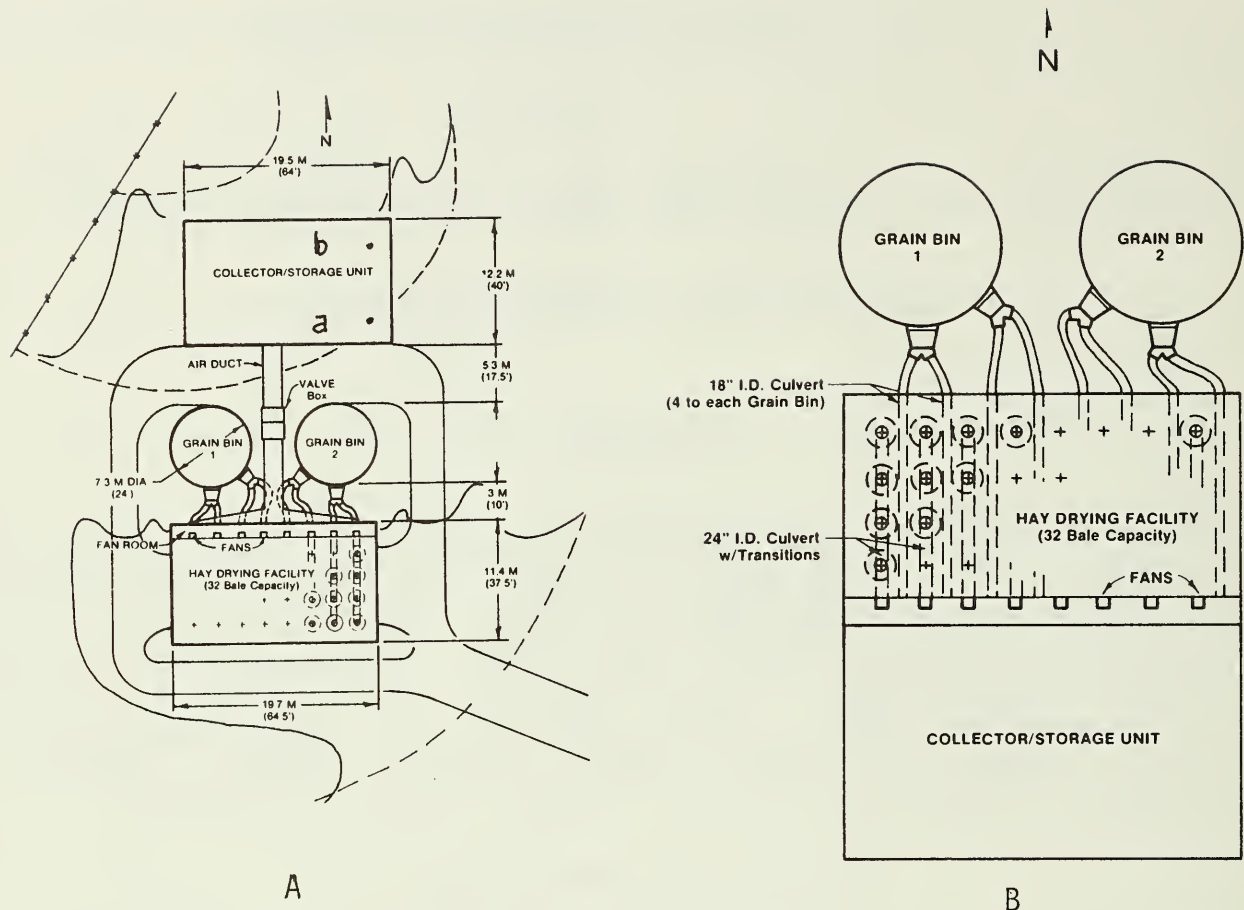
Site plan of the drying facility: (A) As constructed; (B) Revised arrangement proposed to reduce construction cost.
